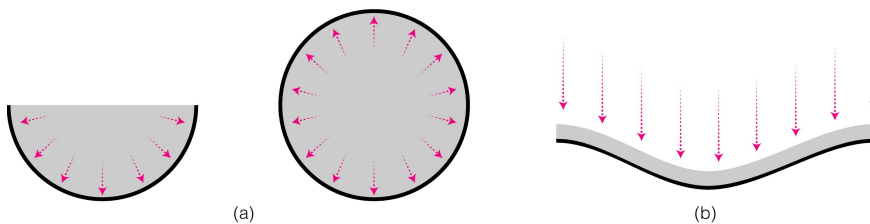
Types of fabric formwork moulds: (a) filled moulds; (b) surface moulds.
